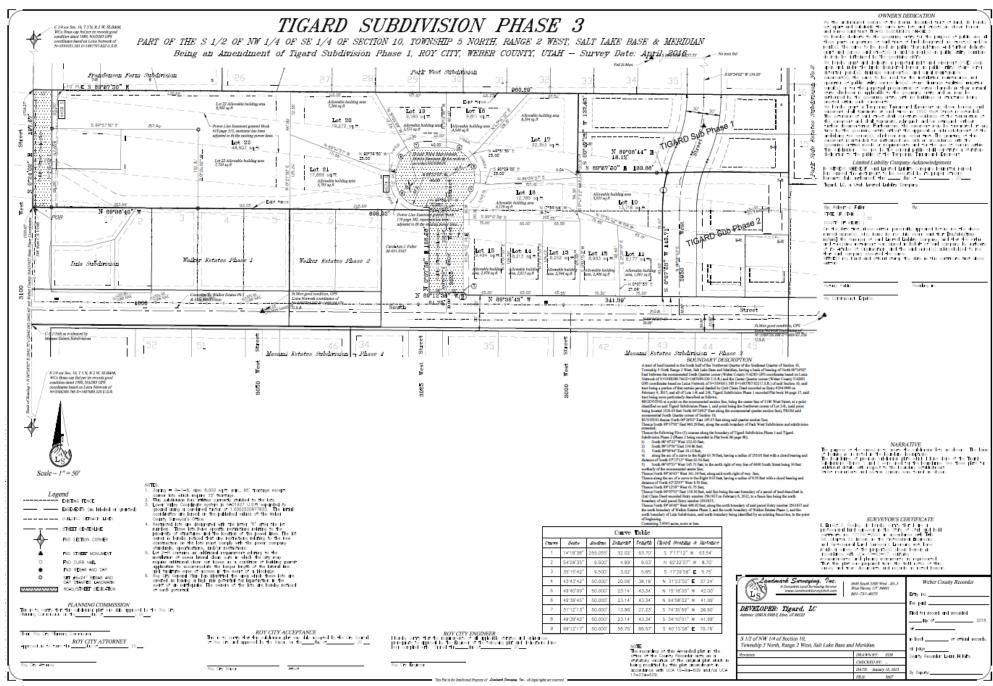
EXHIBIT "B" - PROPOSED SUBDIVISION PLAT
